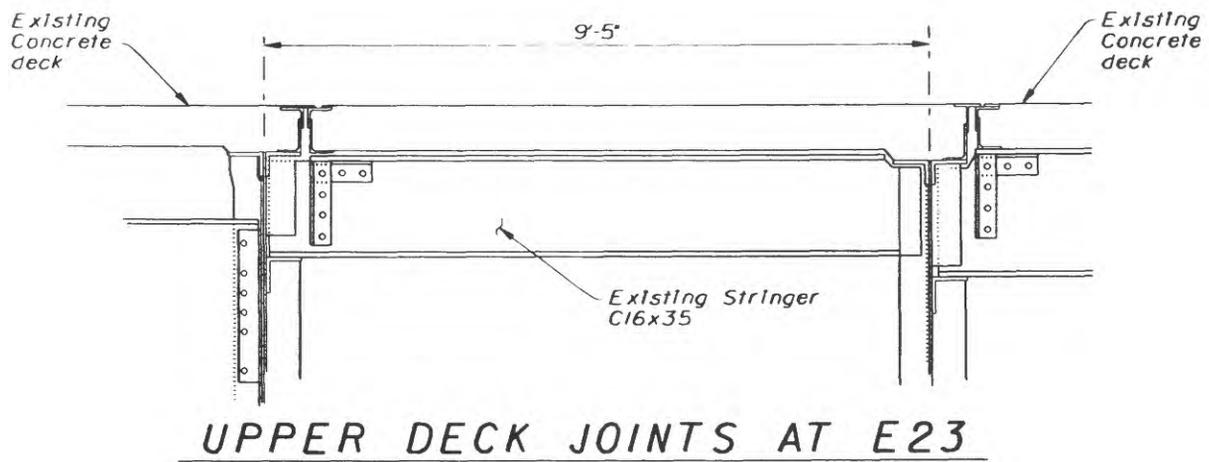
Plan drawing of steel girders, floor beams, and girder seats at Pier E23 of the East Bay Crossing.
